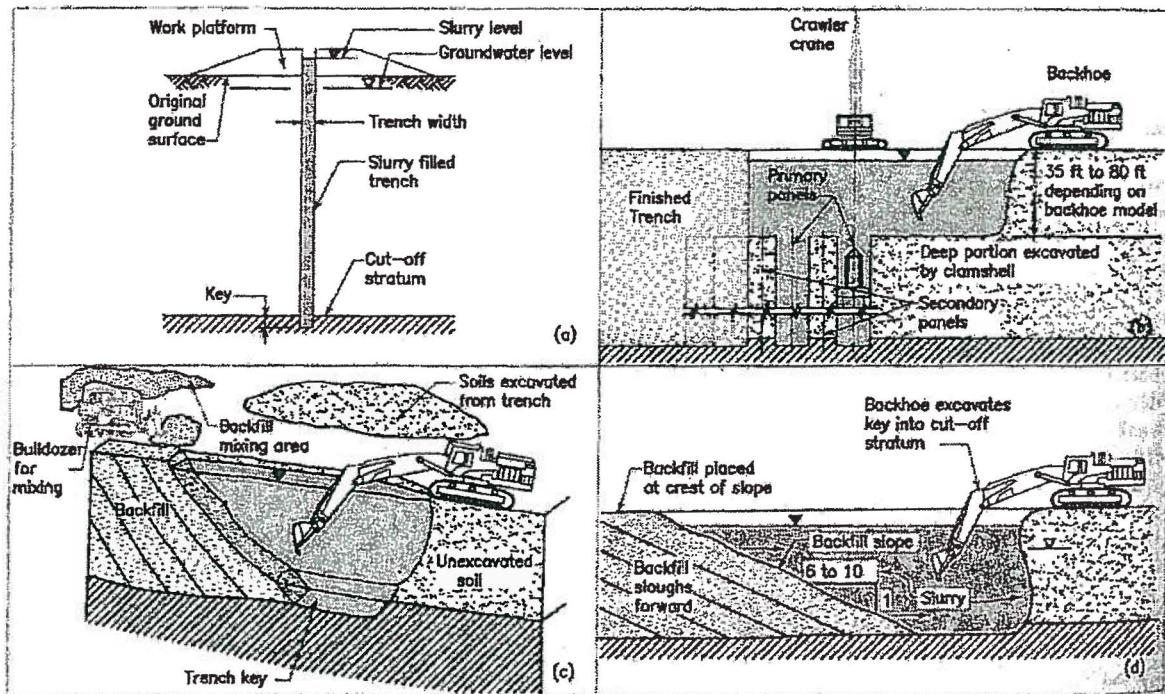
Slurry trench construction. (a) Definitions and terms. (b) Trench excavation proceeds to a suitable cutoff stratum with bentonite slurry used to maintain trench stability. Excavation to depths of up to 80 ft (24.4 m) is possible with a backhoe. Crane mounted clamshell buckets can be used where greater depths are required. (c) Mixing of the backfill is usually done on one side of the trench using a bulldozer. (d) The mixed backfill is pushed in place by a dozer displacing the bentonite slurry to form the completed cutoff trench. Excavation, mixing, and backfill placement proceed in a more or less continuous process with a minimum length of trench remaining open under the slurry and new slurry added to replace slurry used to mix the backfill and keep the trench full.
